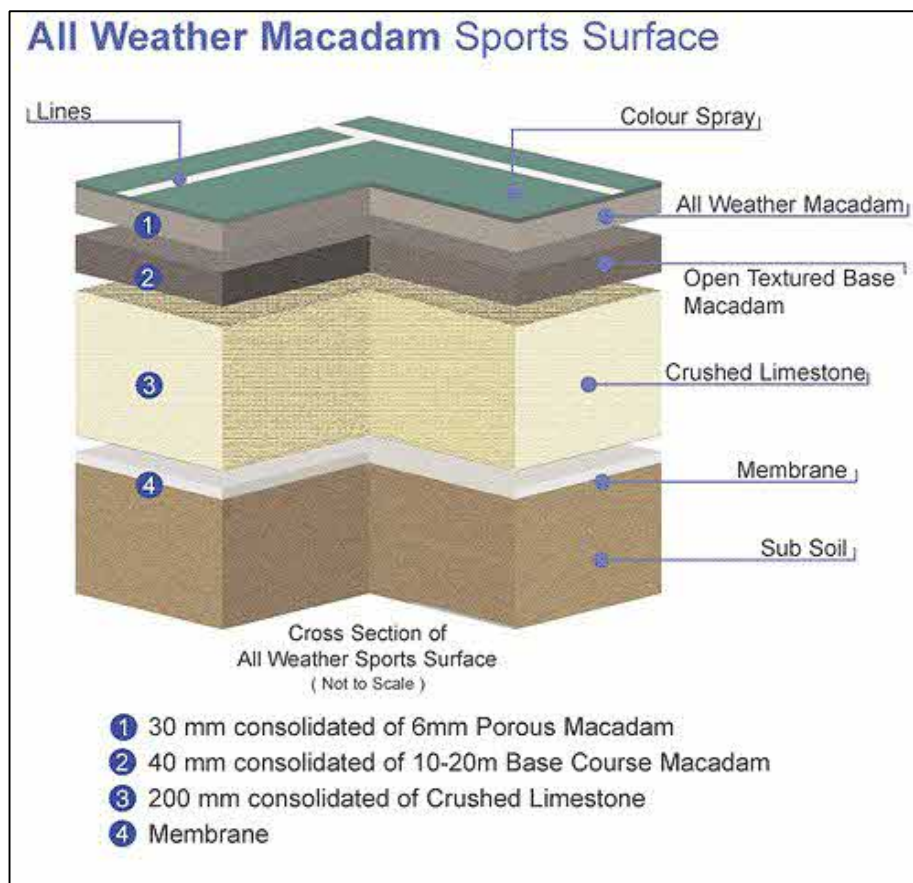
Example of Macadam construction with acrylic green surface with white acrylic line markings
